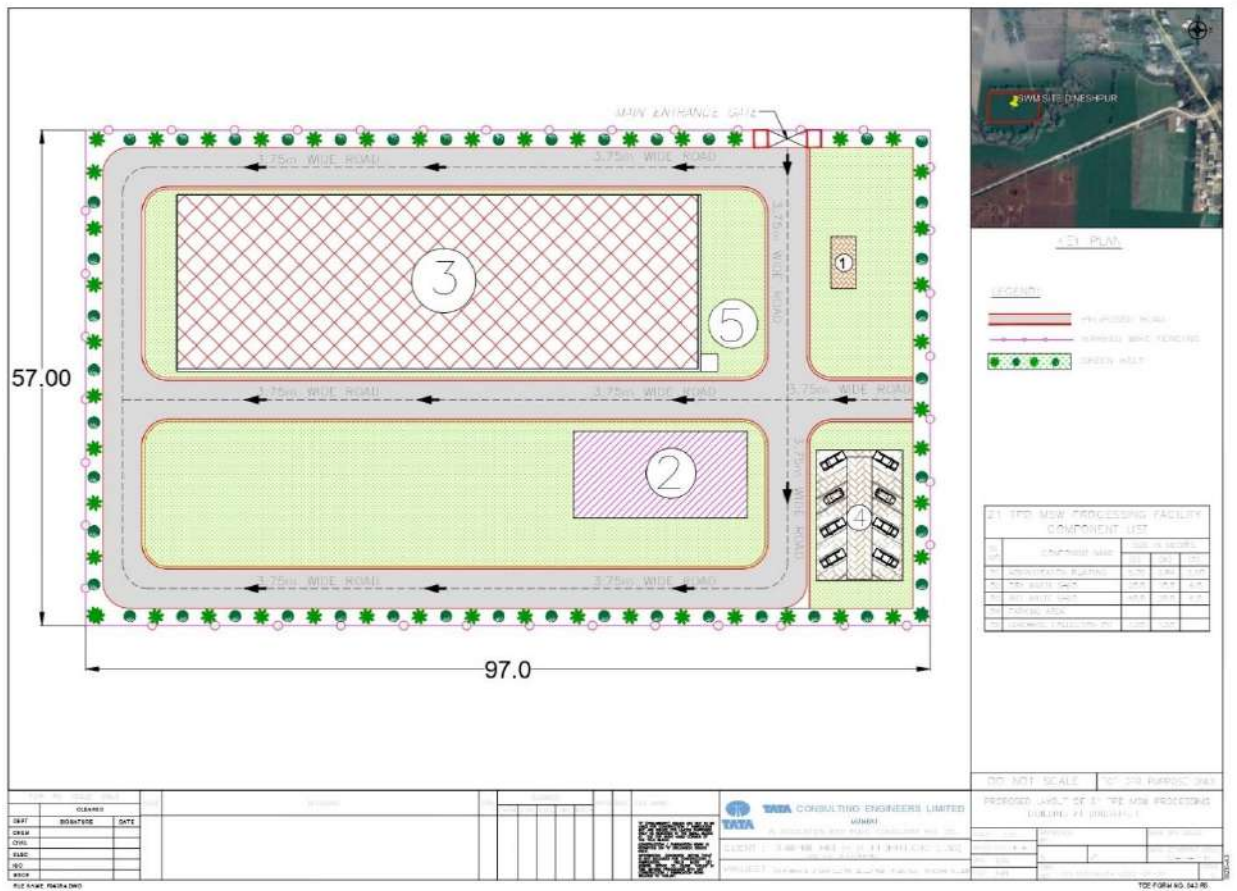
Proposed Project Layout Plan - Dineshpur
